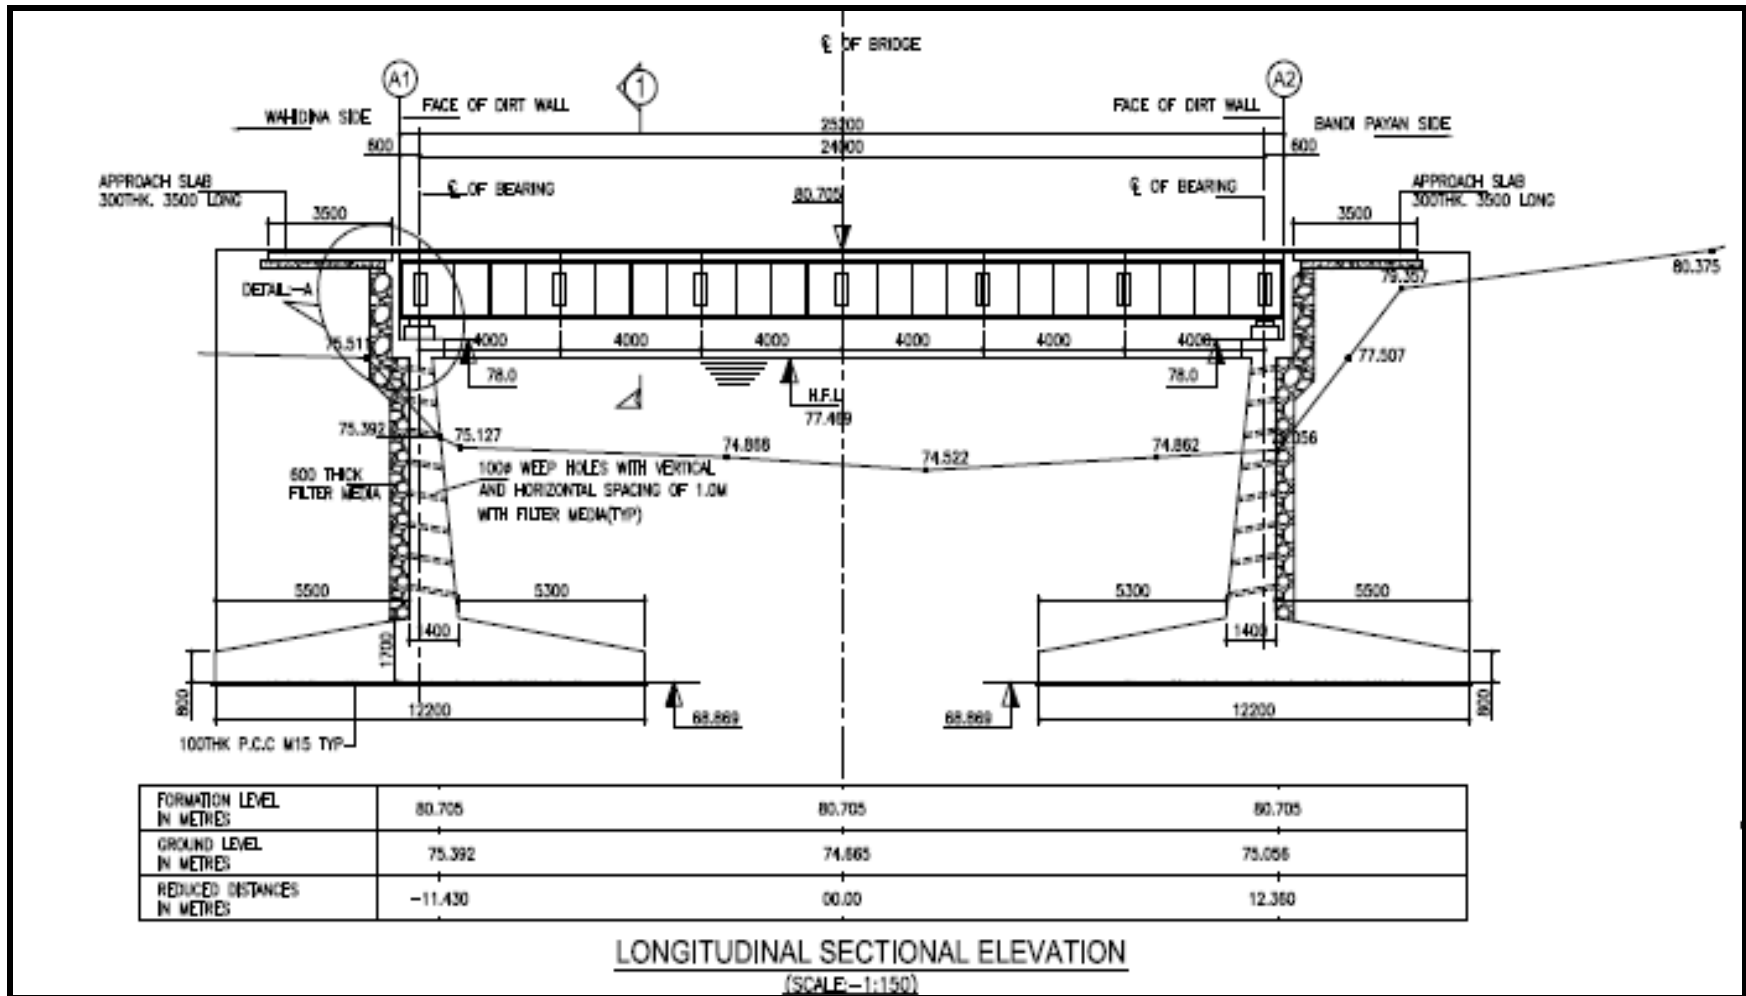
General Arrangement Drawing (GAD) for Proposed Bridge at Wahidina
